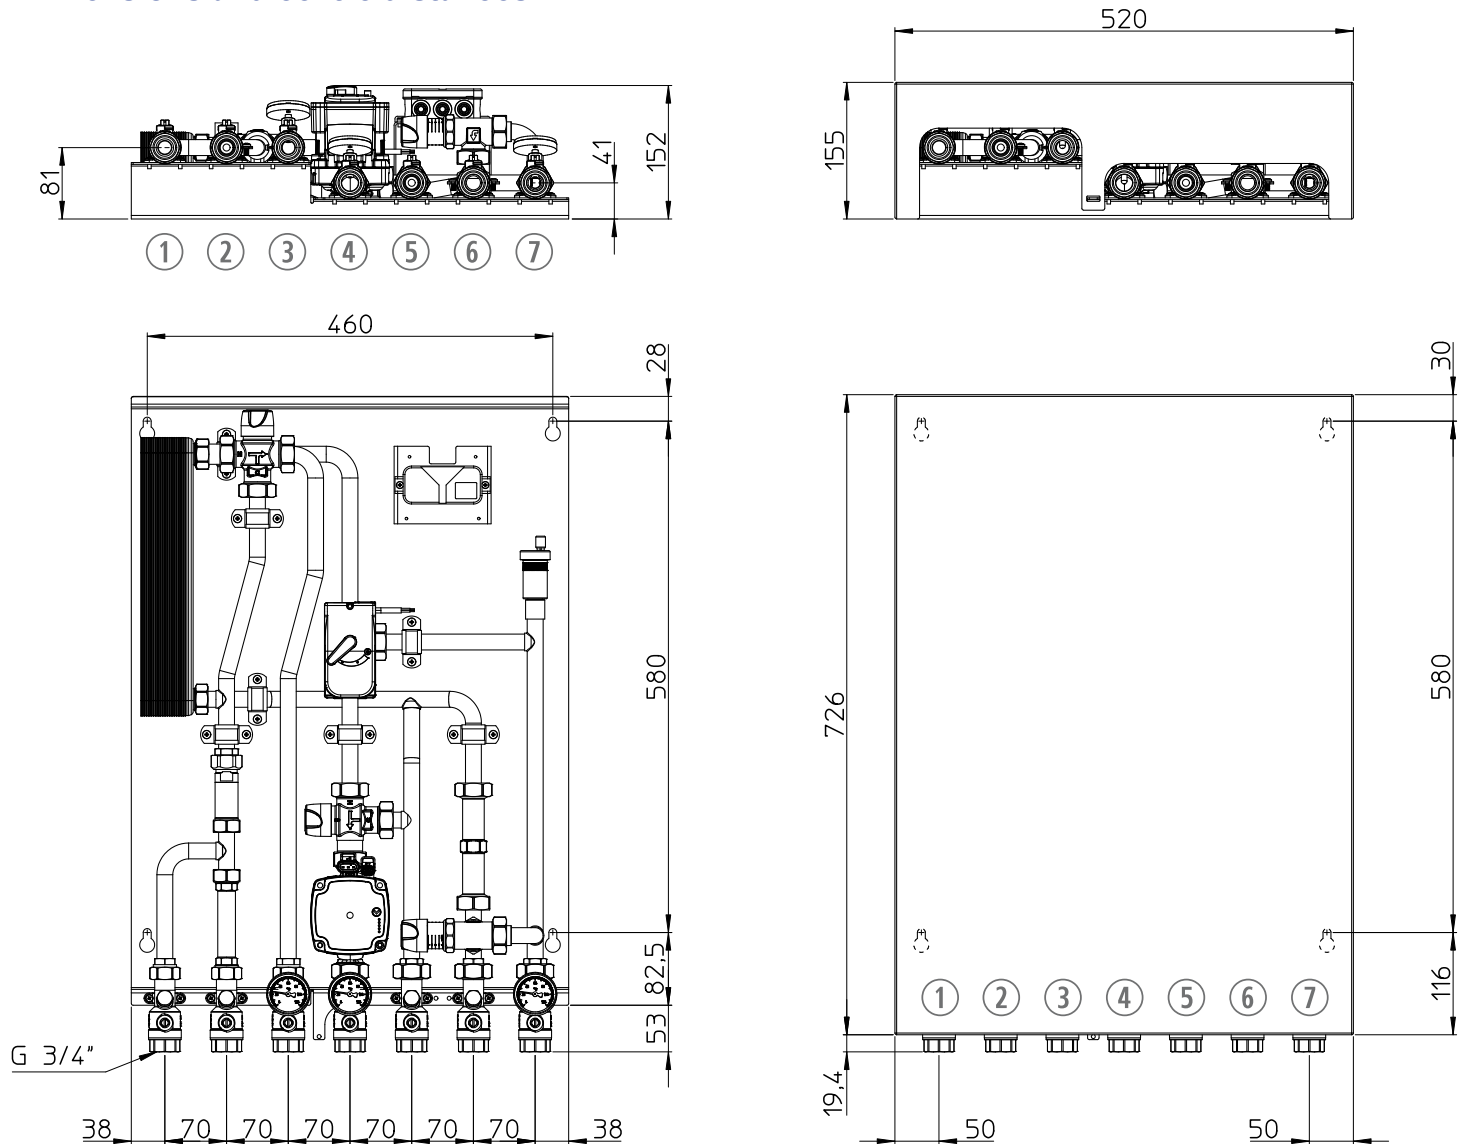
Module wall installation scheme, dimensions and significant centre distances.
